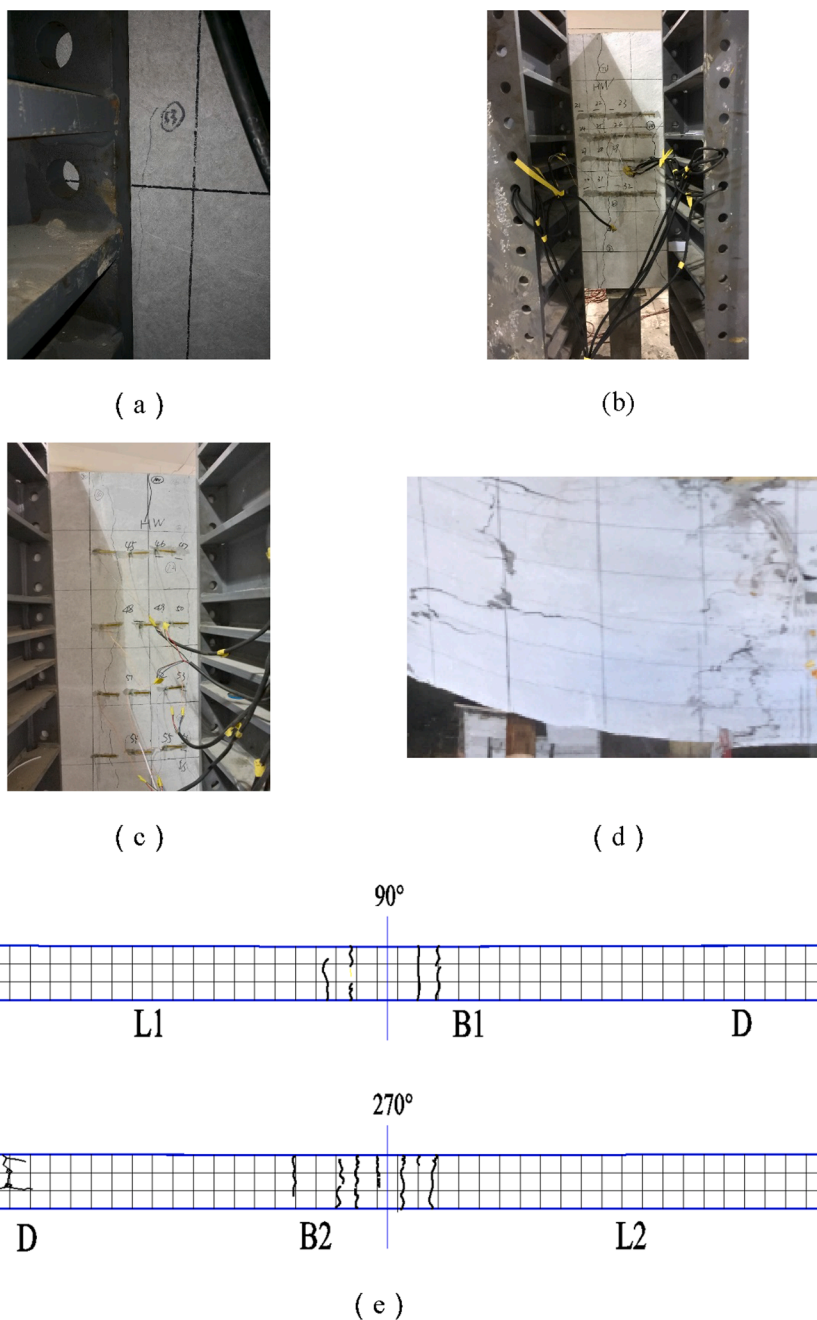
Segment failure: (a) first crack at 270°; (b) cracks at 90°; (c) cracks at 270°; (d) concrete failure at 180° and 195°; (e) region of segment failure.
